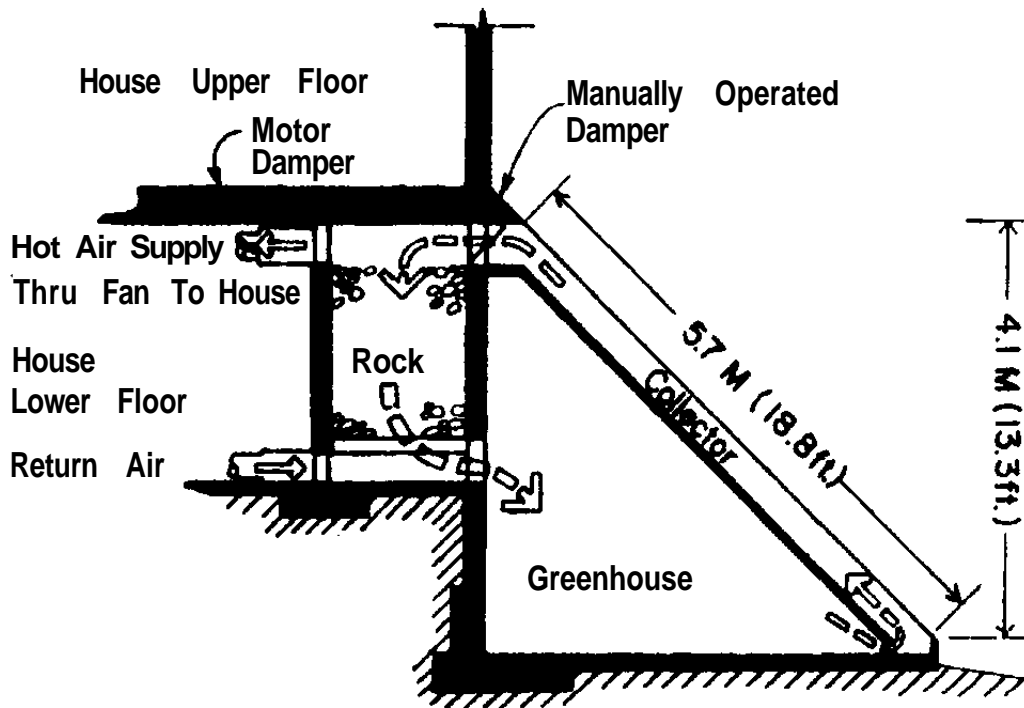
The Jones House - cross-section of the solar system (HUN-1).
